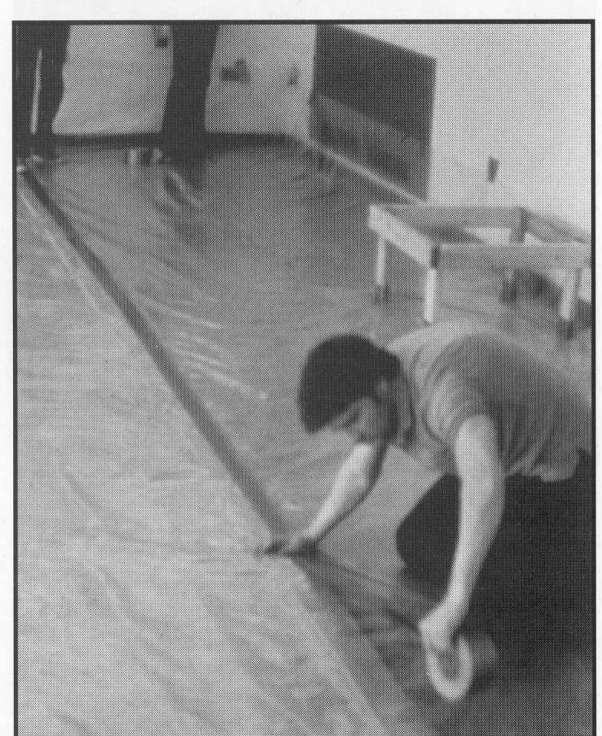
Prepare the Worksite With Plastic Sheeting (interior).
